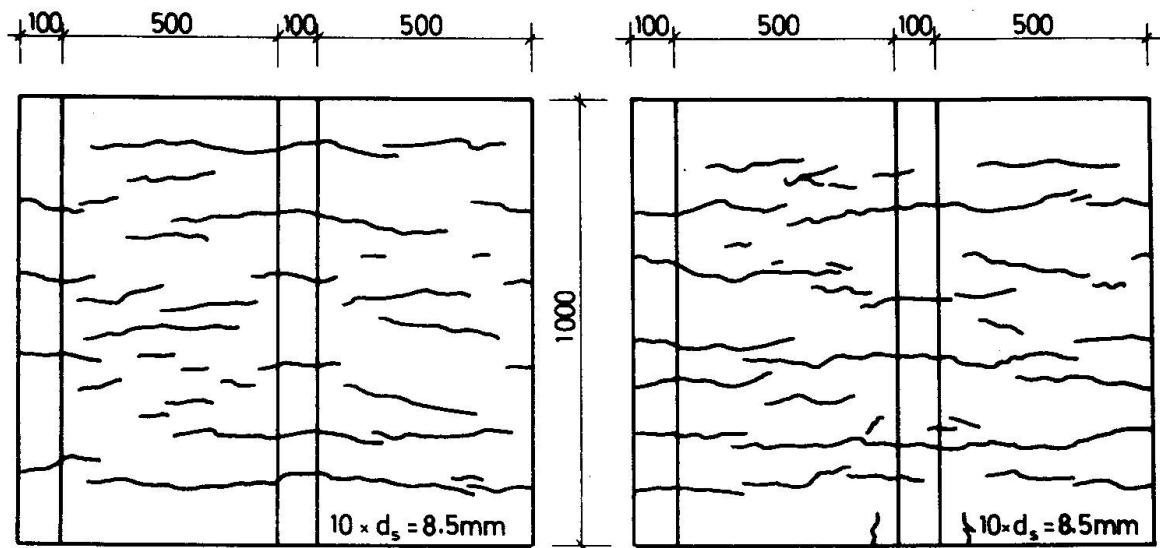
Crack pattern of reinforced concrete panel B 19 ($Q = 0$)
